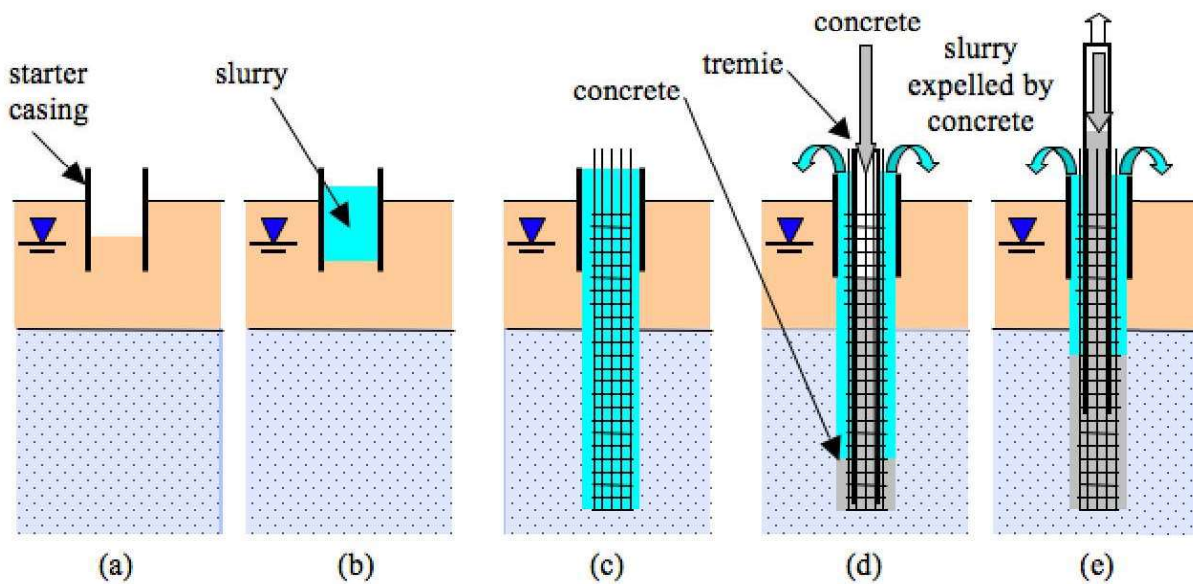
Slurry Drilling Process: (a) set starter casing; (b) fill with slurry; (c) complete and clean excavation, set reinforcing; (d) place concrete through tremie; (e) pull tremie while adding concrete
